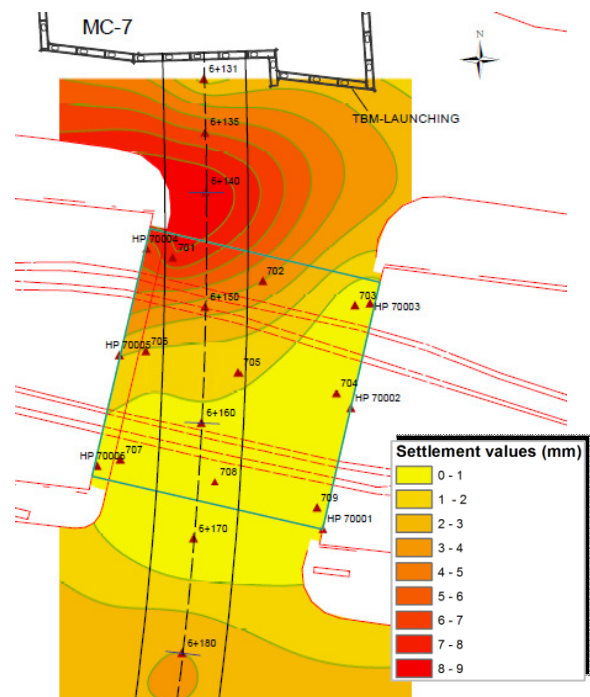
Tunnelling-induced settlement from Station MC-7 to the complete crossing of the bridge
